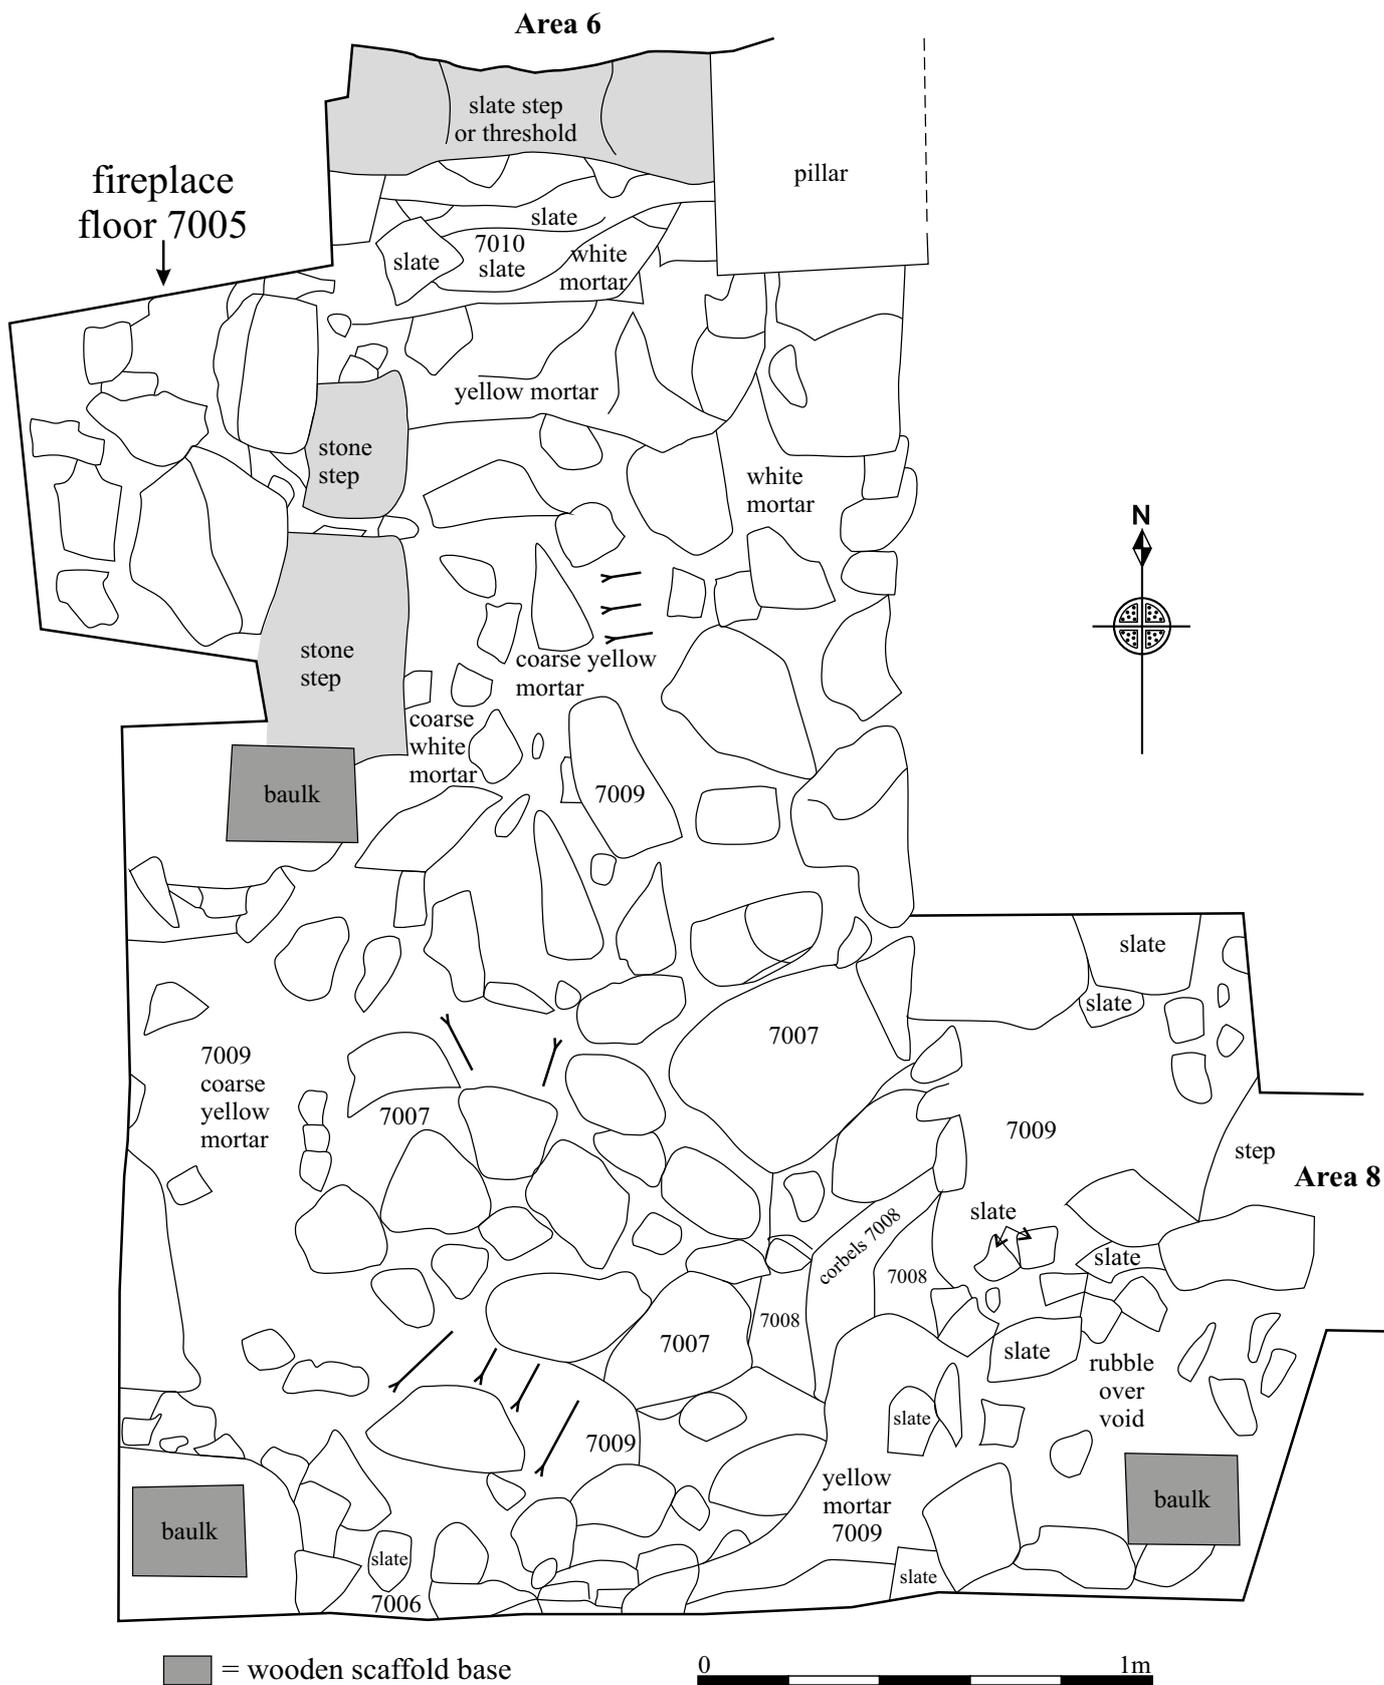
SW [caphouse] Area 7, SW caphouse floor, with cobbles (7007), corbelling (7008) of kitchen fireplace on floor below and wall core (7009)
